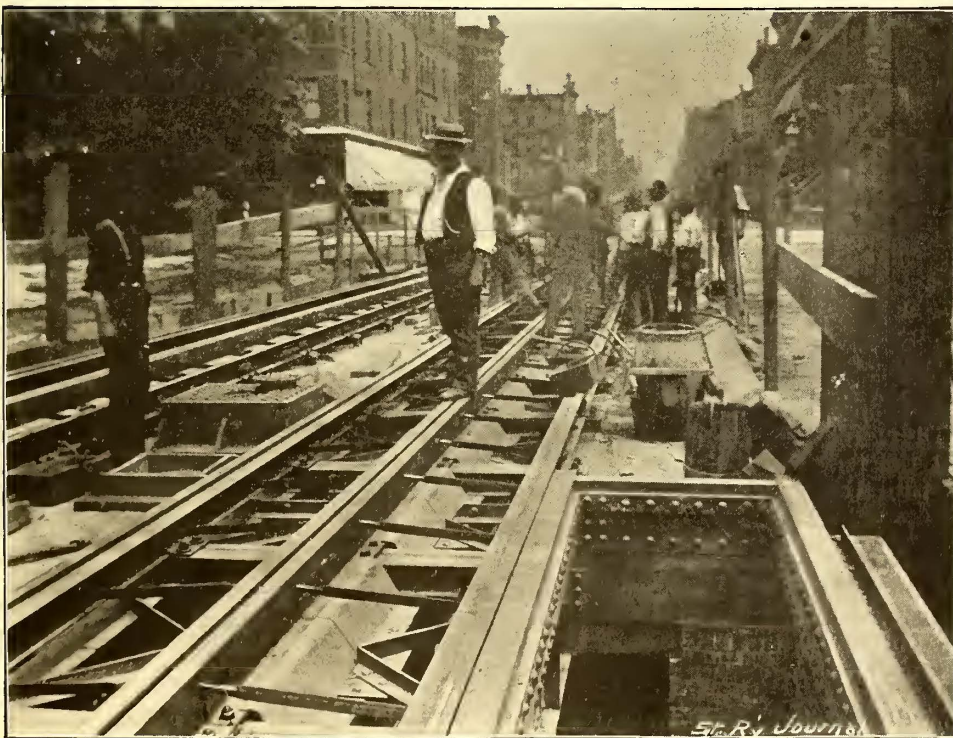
VIEW OF CABLE CONDUIT CONSTRUCTION ON LEXINGTON AVENUE LOOKING NORTH FROM 76TH STREET—NEW YORK CITY.
